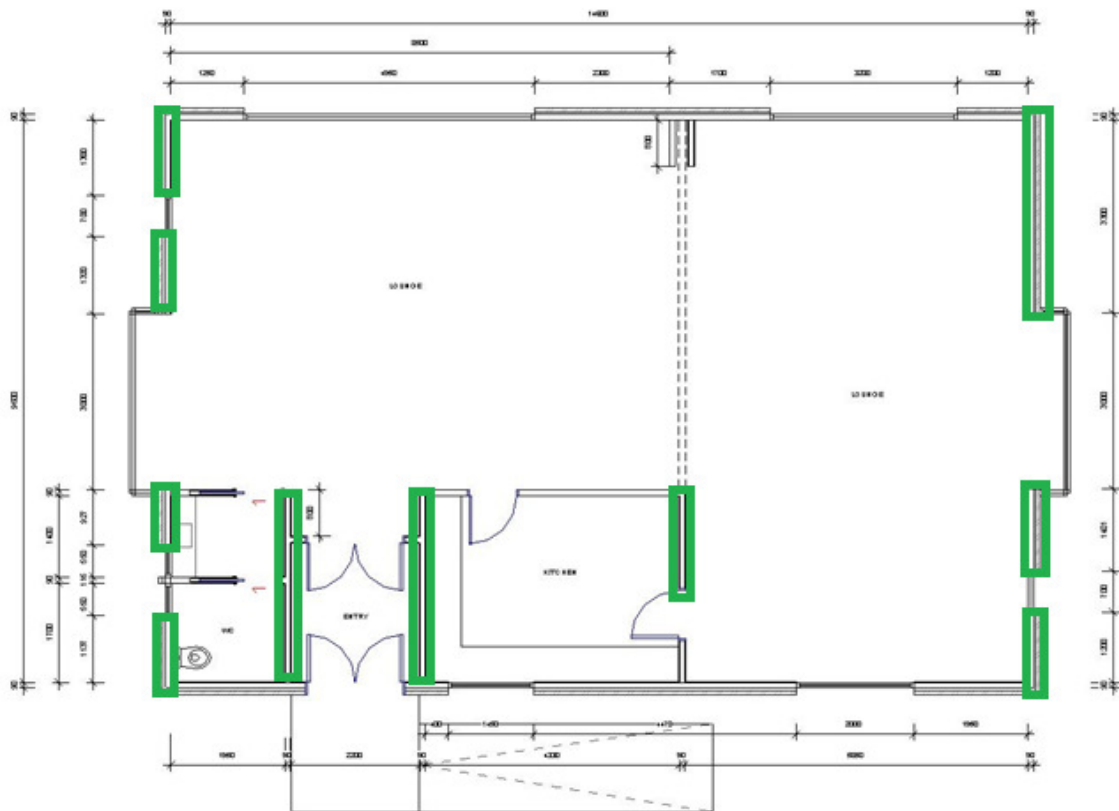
Walls in the residents lounge used for bracing in the transverse direction.
